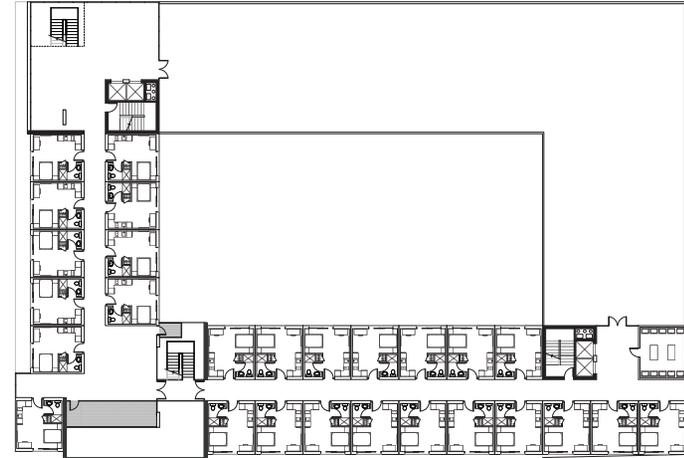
Lounge 3 to 4 plan 1/32" = 1'
